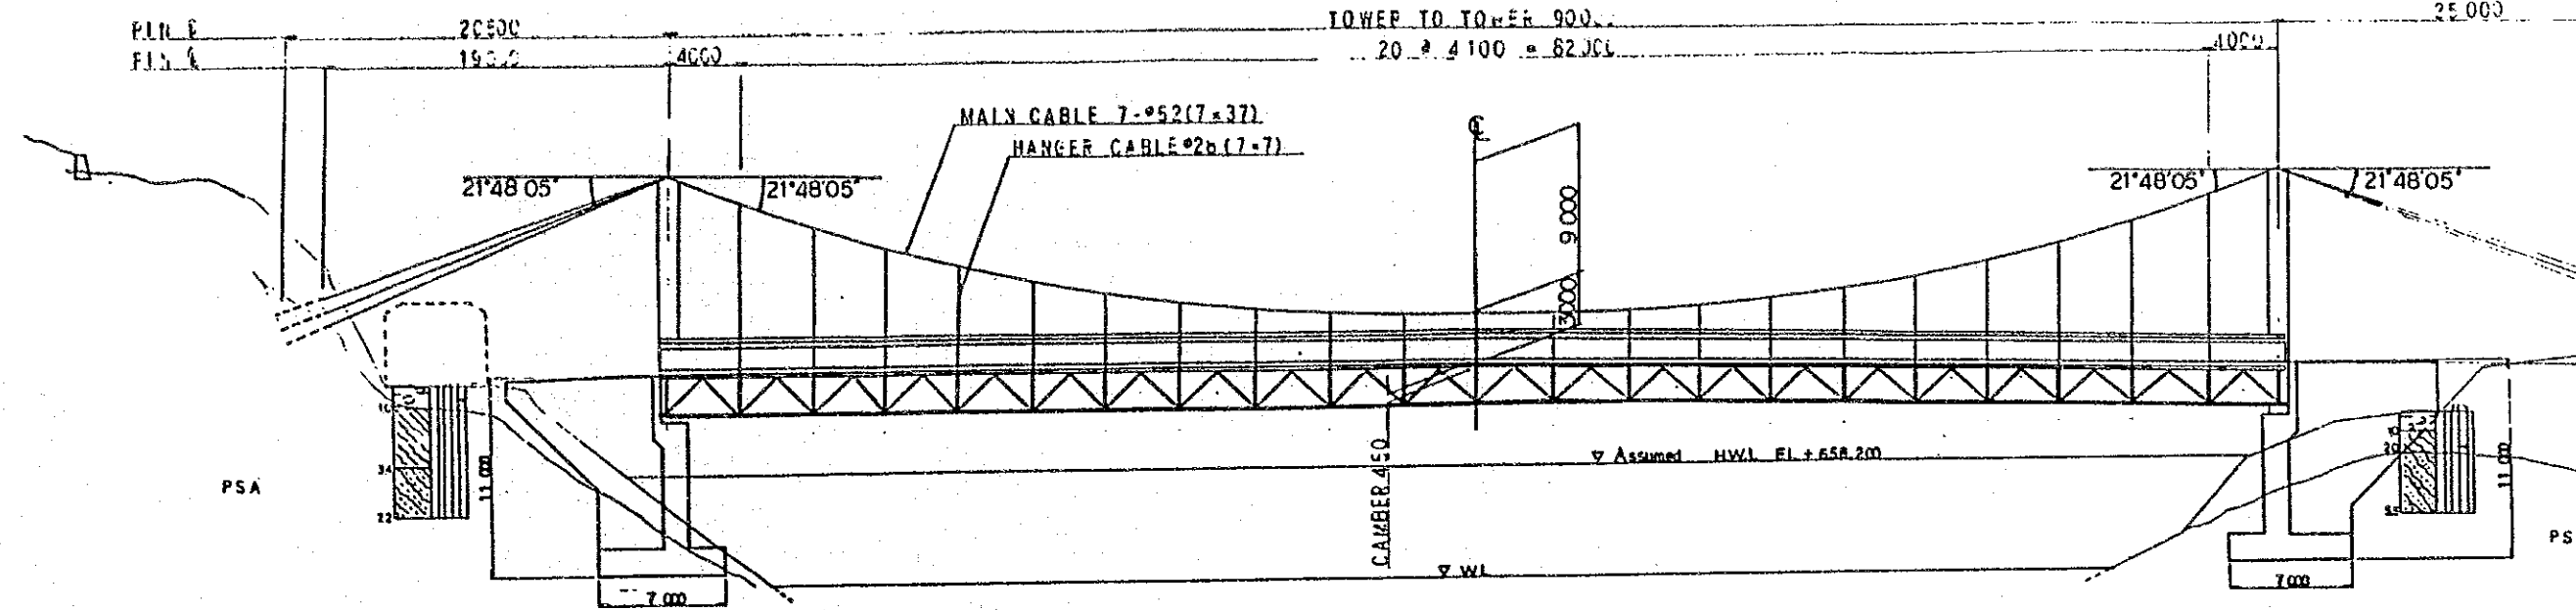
General Layout Plan of the No.18 Jahazona Dak Bridge
